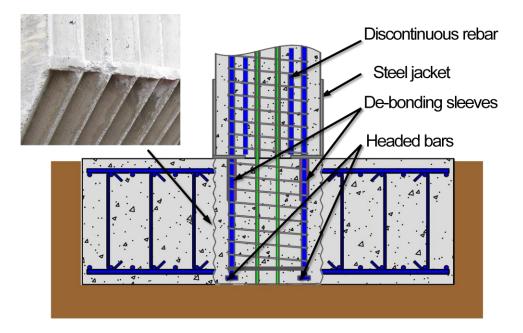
Base Detail for Precast, Pretensioned Rocking Column Bent
